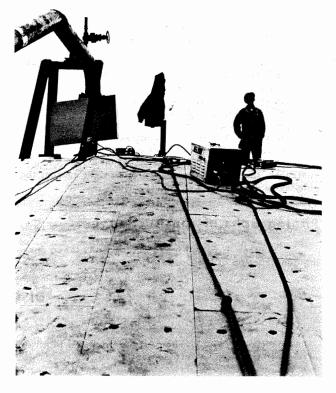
First layer of Styrofoam, impaled on the studs, in place on the roof.
